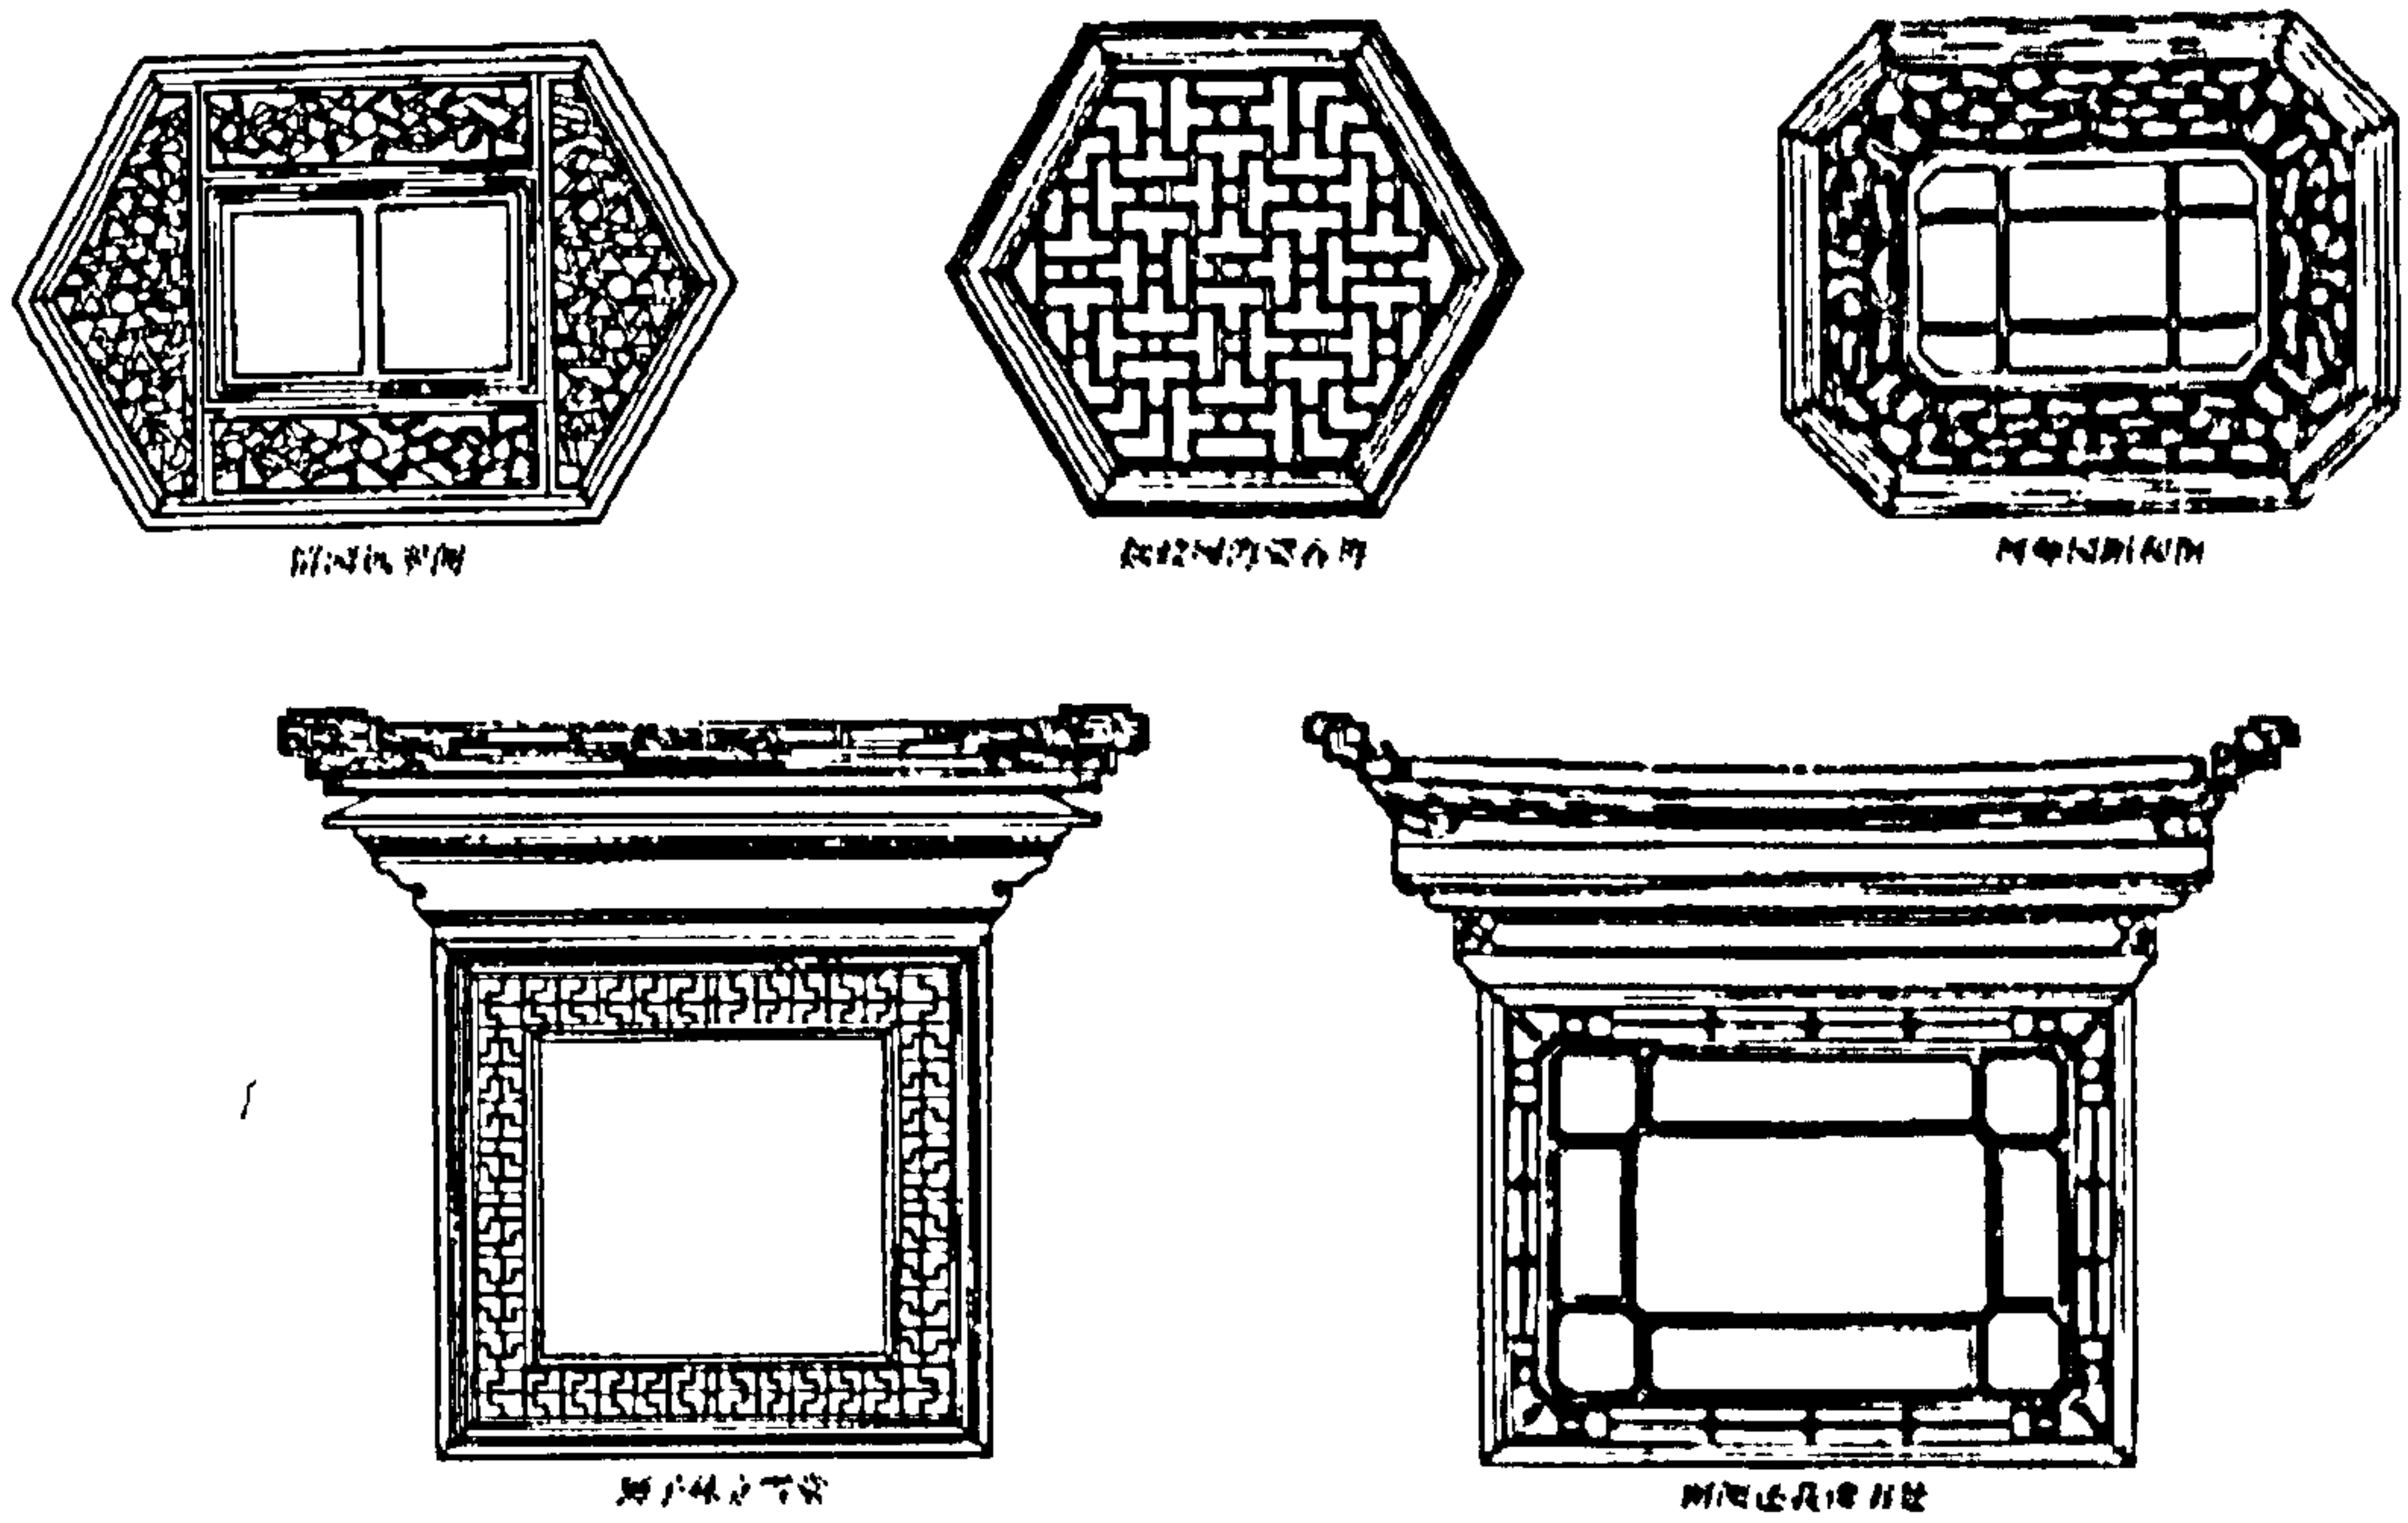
The Examples of Window Pattern in Jiang Nan Garden
